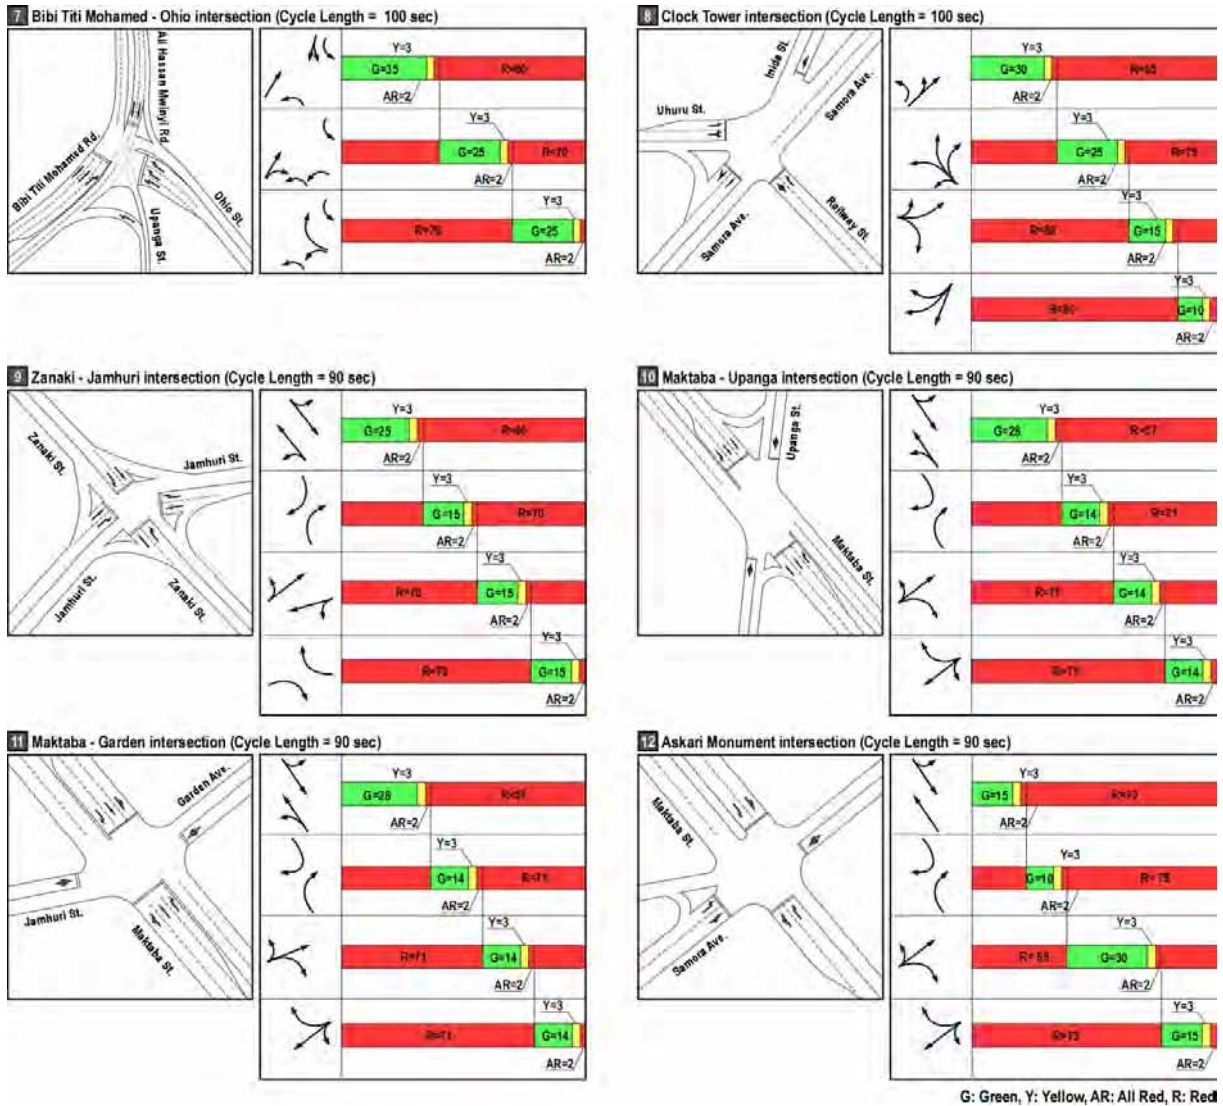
Intersection Improvement Plan (Part 2 of 2)
